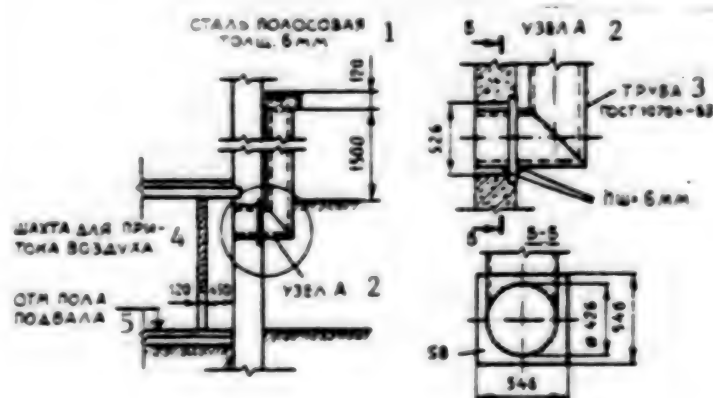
Ventilation shaft for air intake and removal with natural ventilation of shelter for 25 people. Two metal shafts (dimensions in mm) would be installed for shelters for 50 people. 1 - 6 mm steel strip; 2 - structure A; 3 - pipe (GOST 10704-63); 4 - air intake shaft; 5 - basement floor level.
